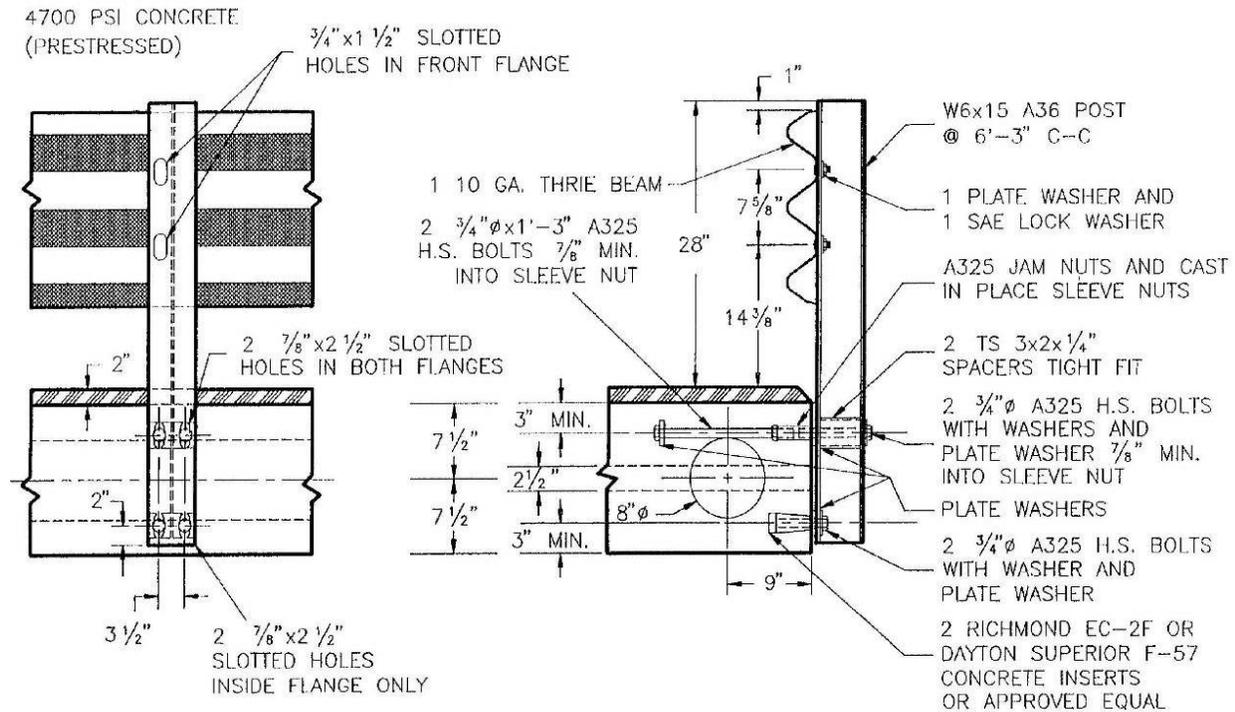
Oregon Side-Mounted Thrie-Beam Rail [25]
